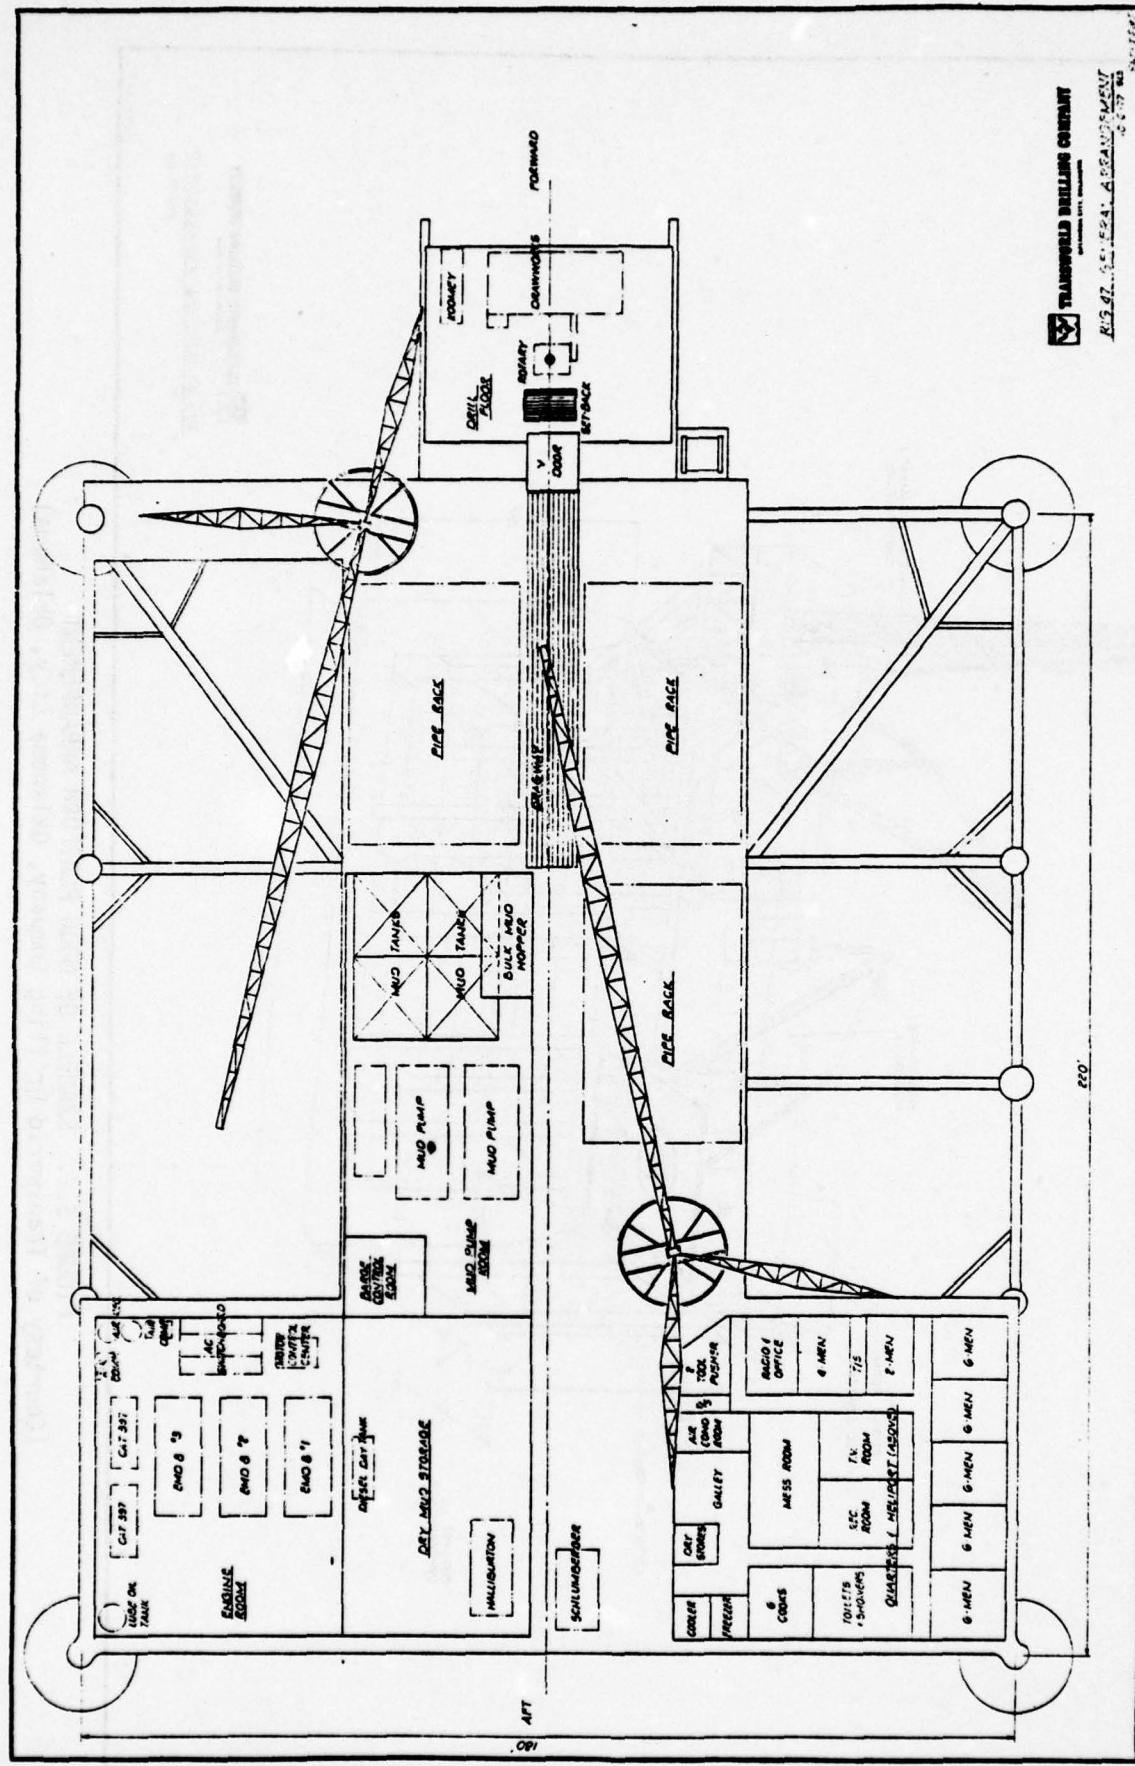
EXAMPLE OF GENERAL ARRANGEMENT OF WORK SPACE ON A MODU, PLAN VIEW
